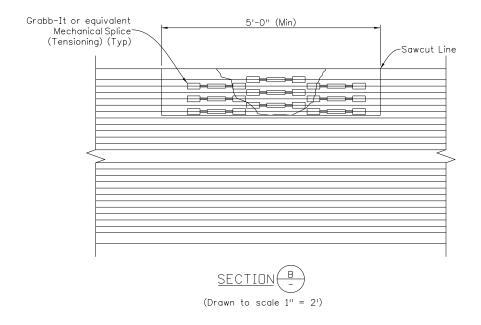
(E)-3 Sample Section of Precast Prestressing Repair
